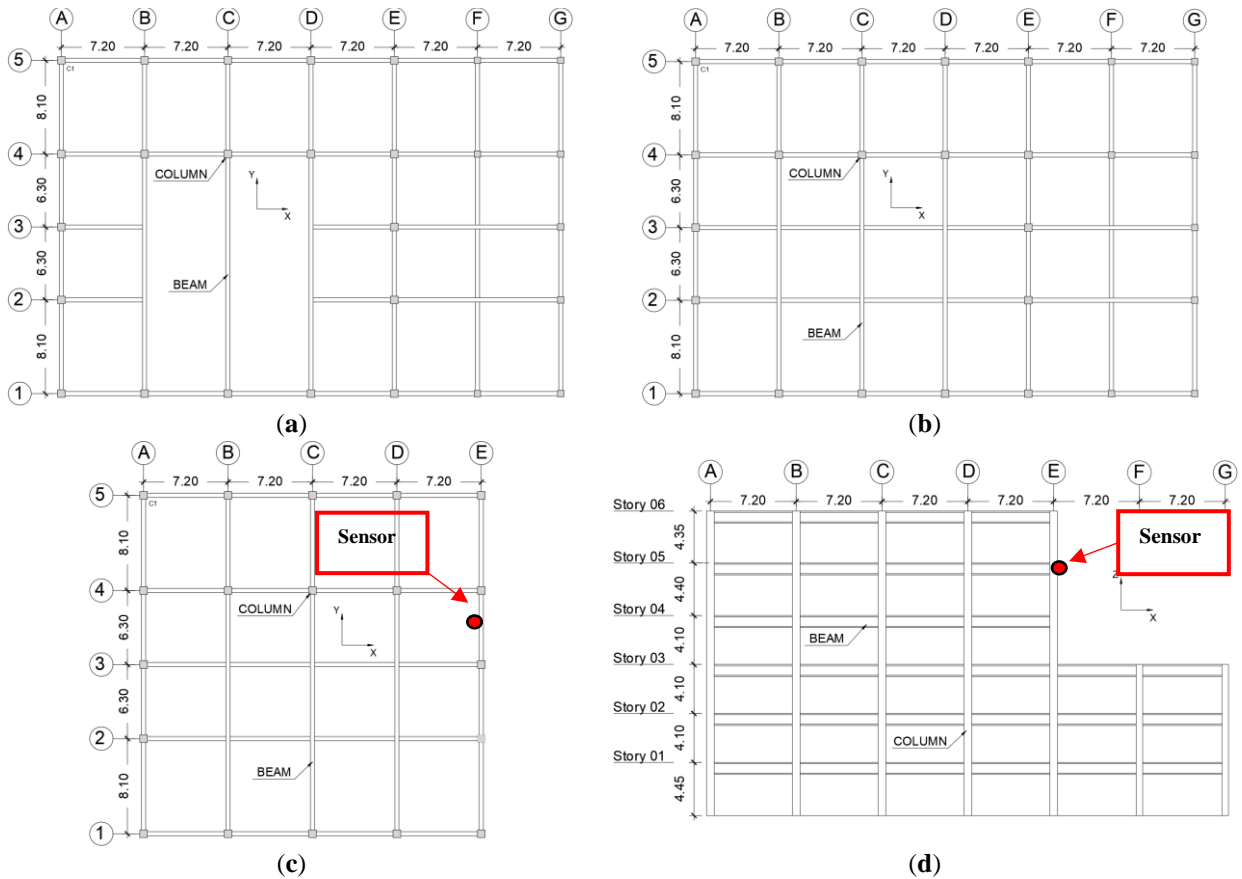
General drawings of Tahara City Hall building. (a) Plan of 1st story view. (b) Plan of 2nd and 3rd stories' views. (c) Plan from 4th to 6th story view. (d) Elevation of X-direction view.
